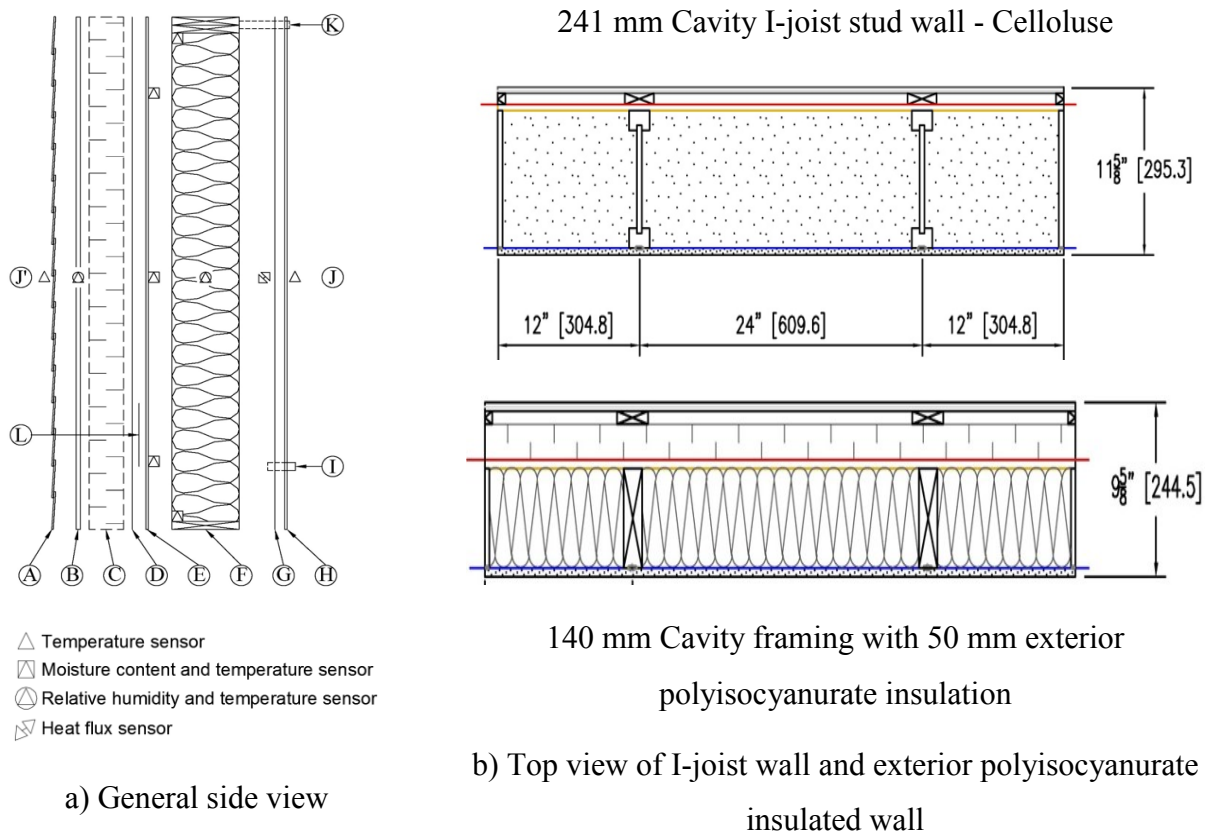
Cross sectional diagram of typical test panel configuration with sensor locations (Fox, 2014)
